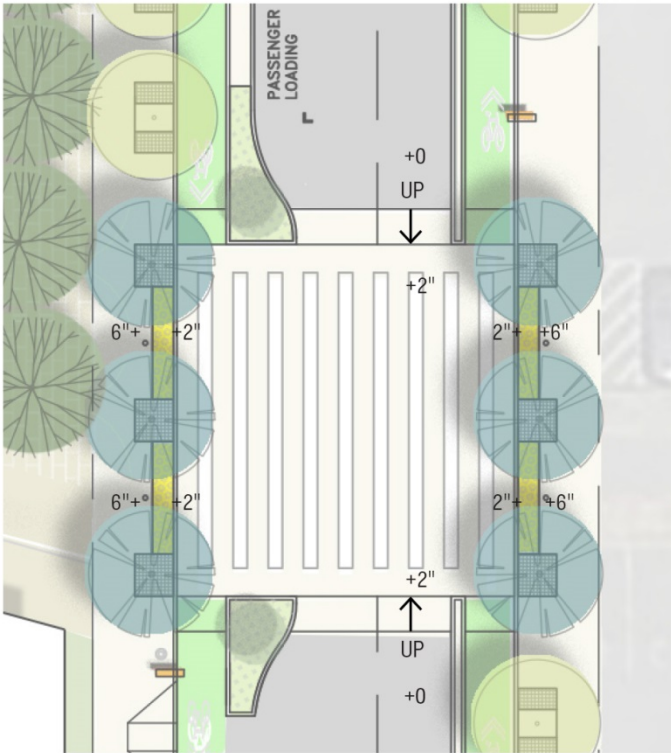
6: Raised Crosswalk at Lee Avenue and Reservoir Park
